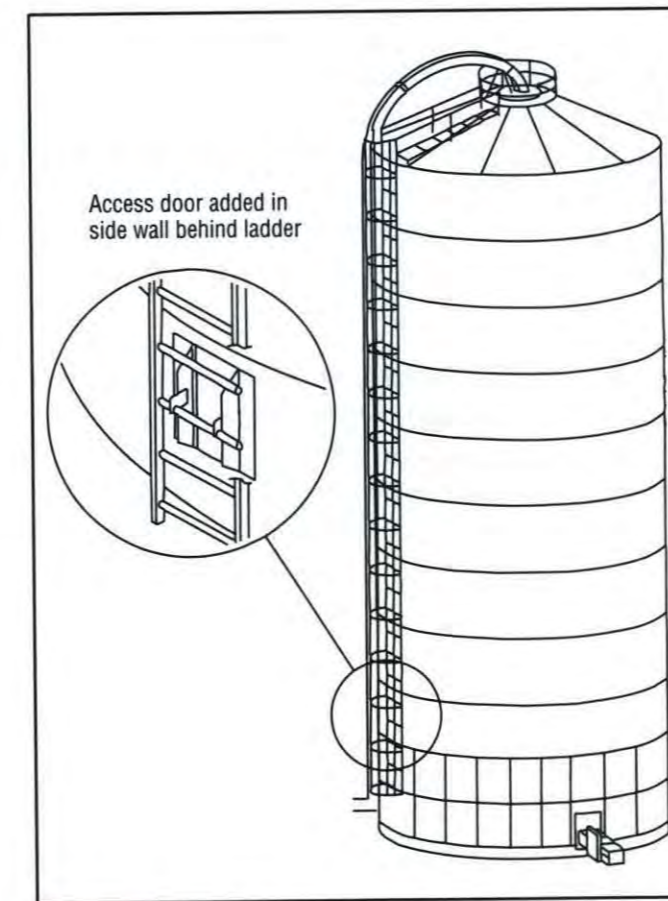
Modified oxygen-limiting silo with an access door added in the side wall
